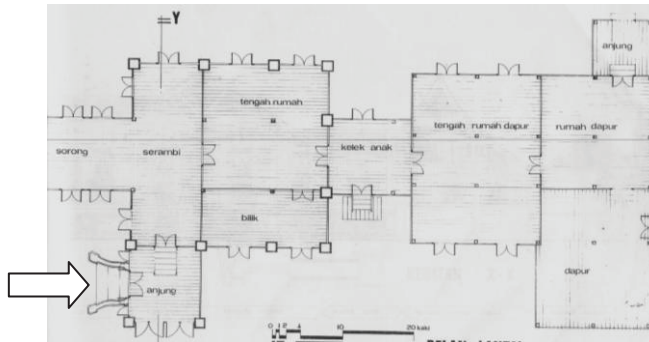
Plan of Elias's house, a Johor traditional house; Source: KALAM (1985)
